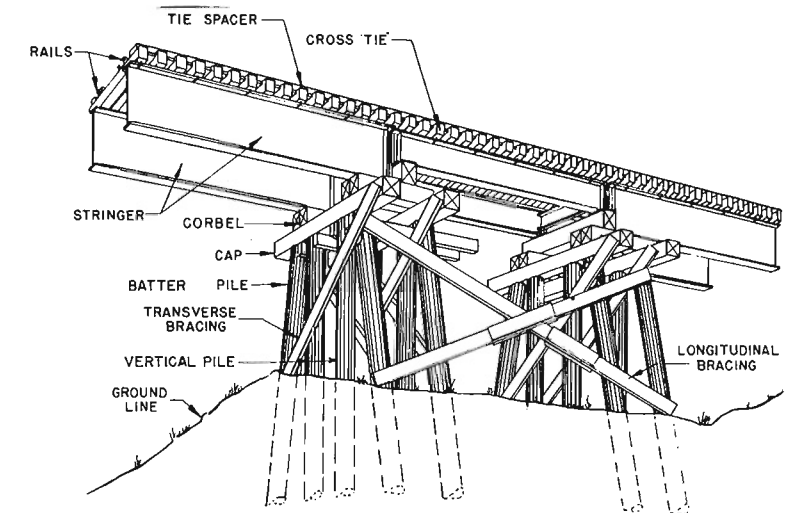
Railway bridge, steel stringers on braced timber pile piers.
